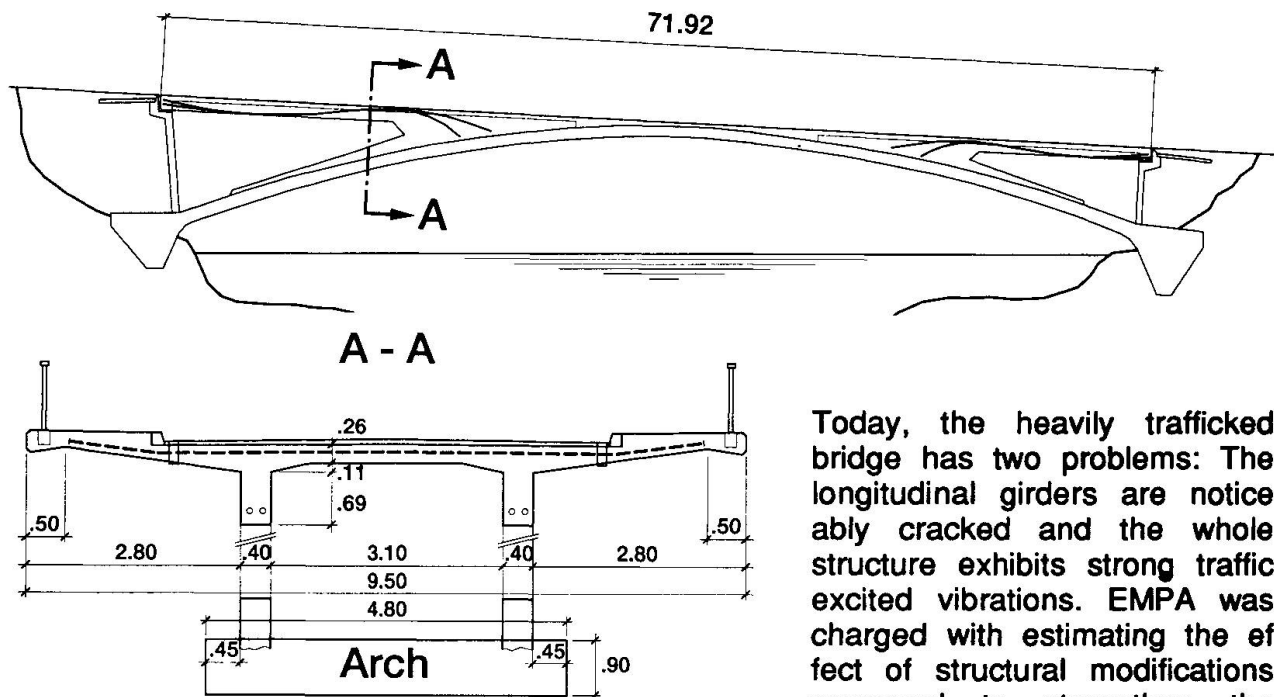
Longitudinal and cross section of the Bridge on the Aare River at Aarburg (dimensions in m).
